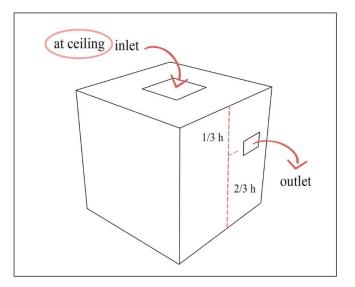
Air Inlet and Outlet Placements for Isolation Rooms
